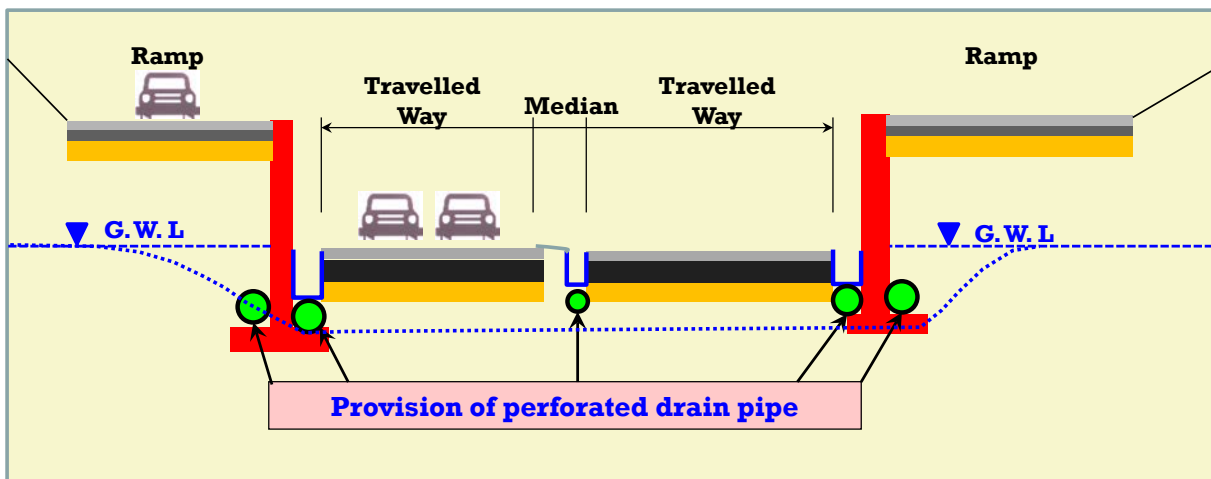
Underground Drainage Pipe Layout in Depressed Section
